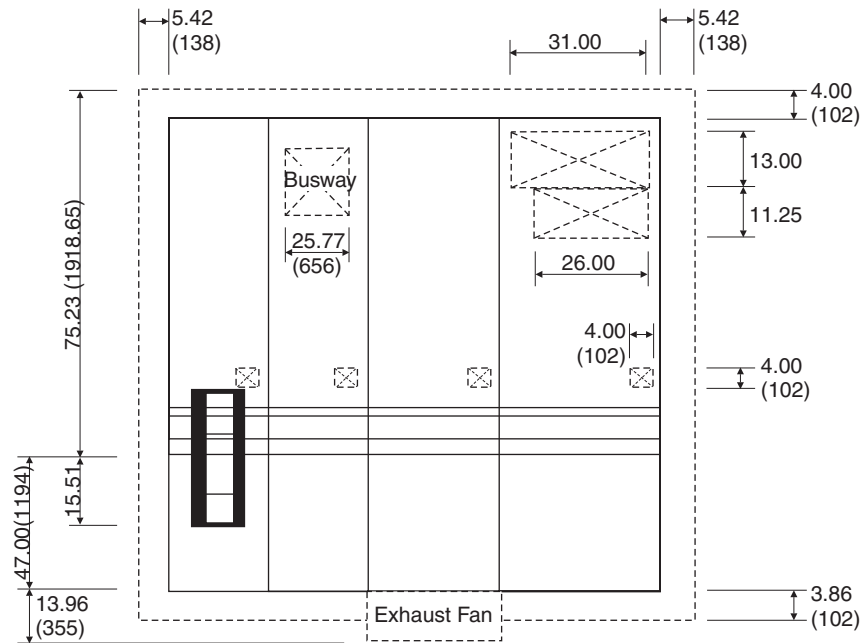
NEMA 3R Walk-in Low Voltage Switchboard/Switchgear Bottom Conduit Entrance Dimensions—Not for Construction (consult factory drawings)
